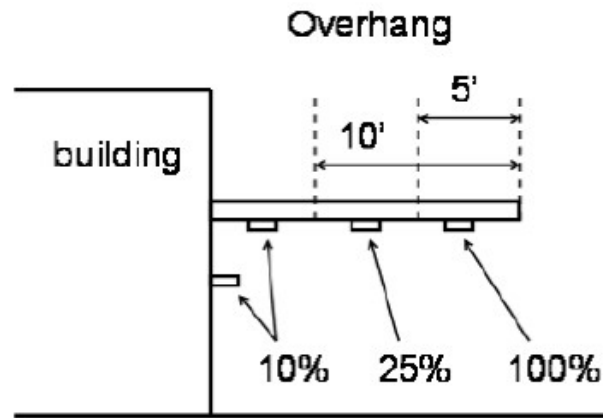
Figure J: Sample elevation view of a canopy or overhang attached to a building, showing location of shielded fixtures and initial lamp output percentage counted toward lumens per net acre or lumens cap, as applicable.
